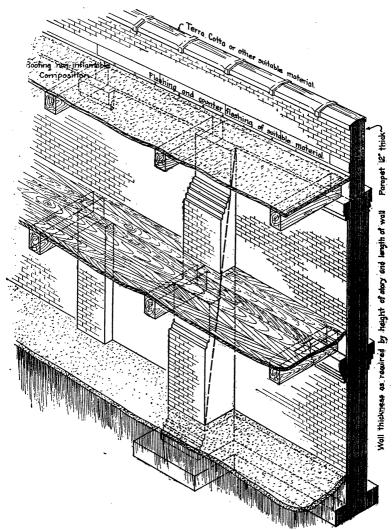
Timbers supported by pilasters, corbels, or offsets and self-releasing. Note the buttress (in the foreground) used for bracing long walls.
